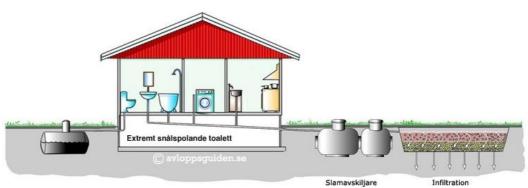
A private small scale sewage plant with WC connected to a cesspool (sealed tank) and greywater connected to a two-chambered septic tank with following infiltration. (Source: ©avloppsguiden.se)
